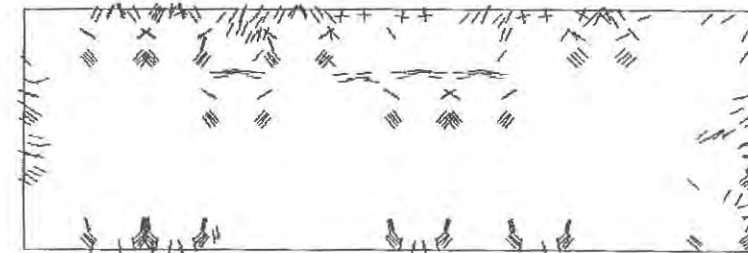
Cracking of concrete specimen due to drying shrinkage.
